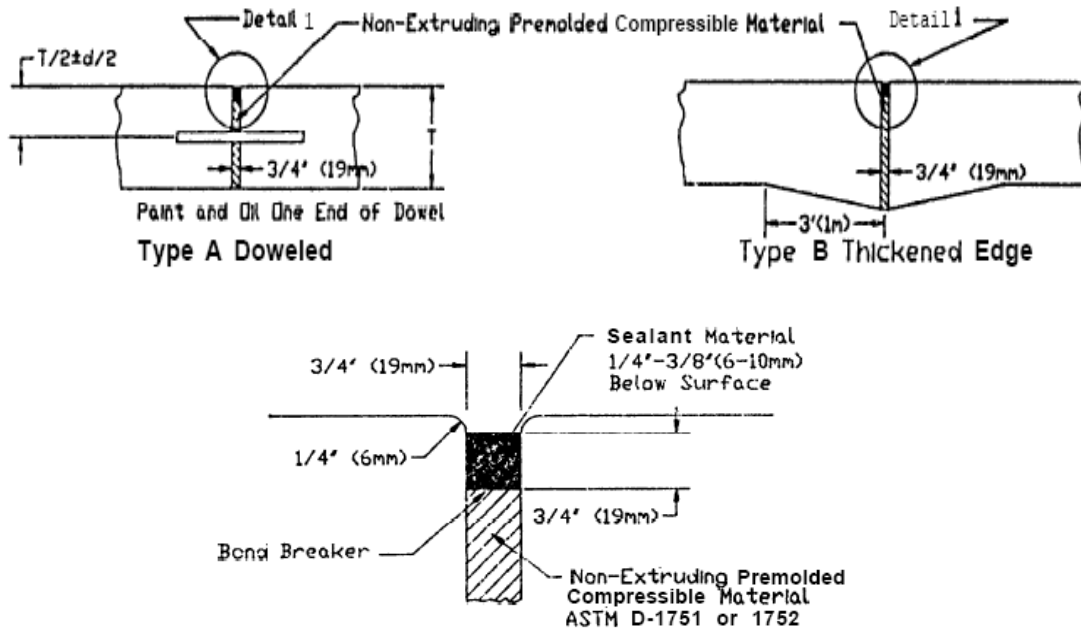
Expansion joint details for light load rigid pavement per AC 150/5320-6D.
